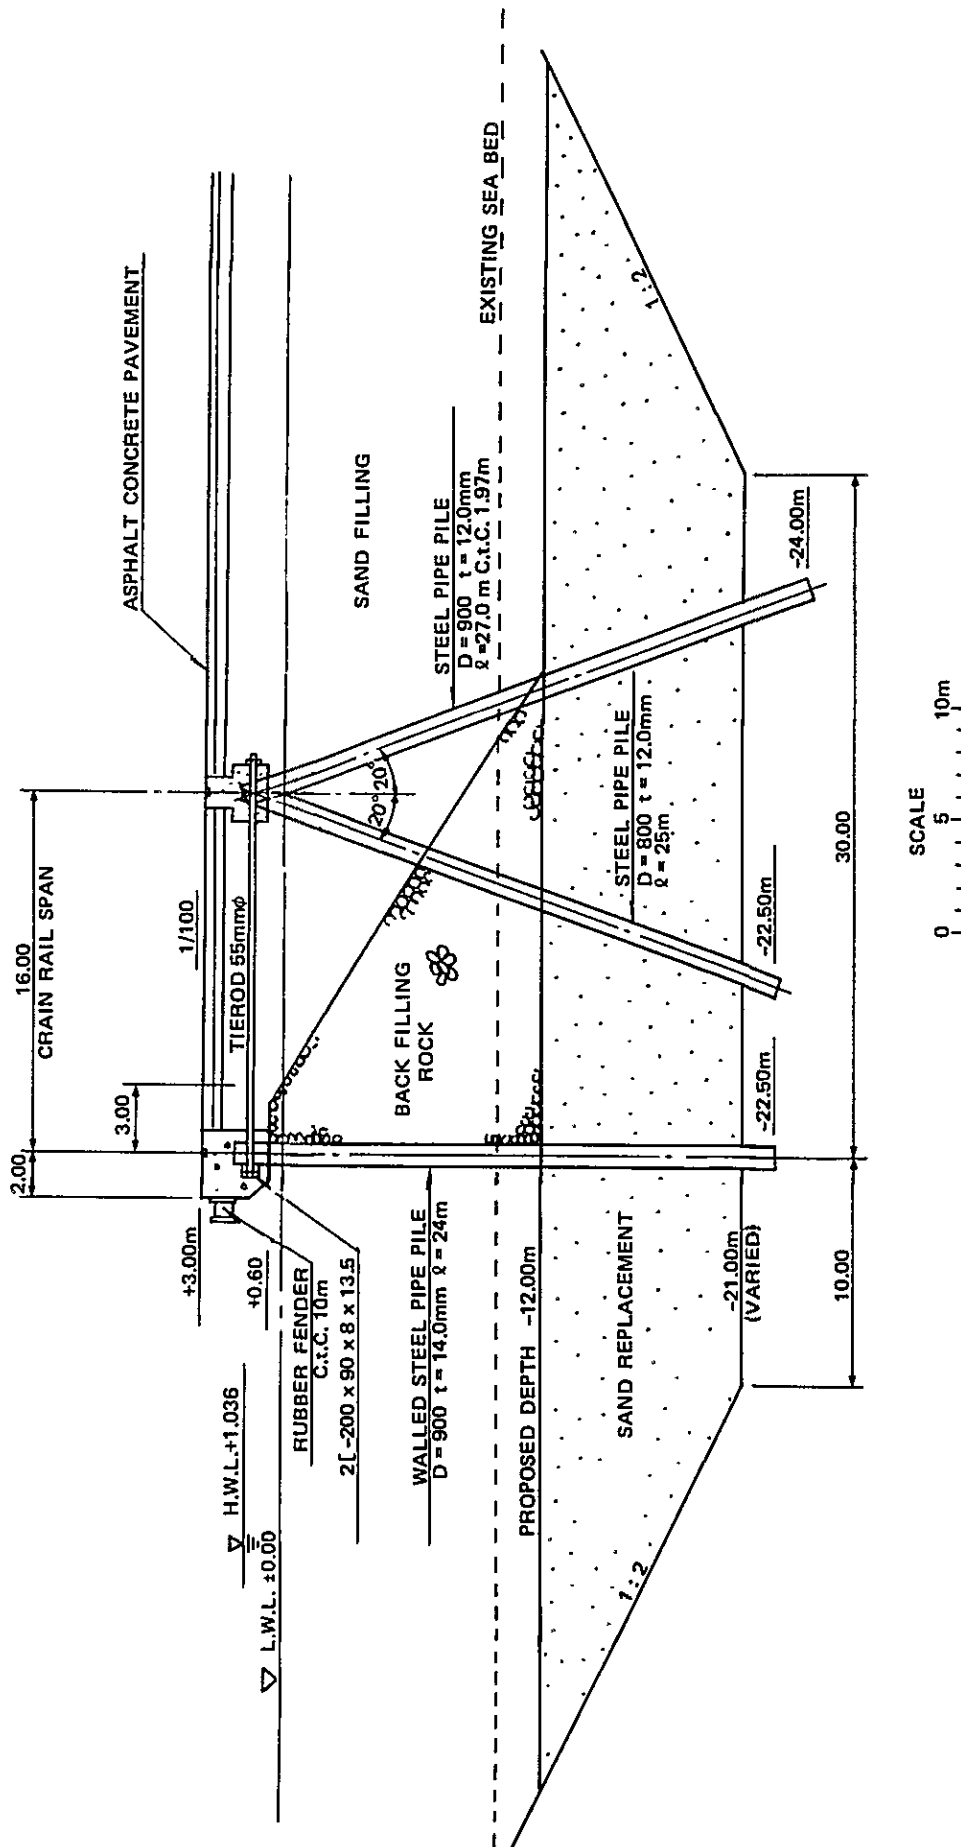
Container Berth Quay Wall (Walled Steel Pipe Pile Type)
